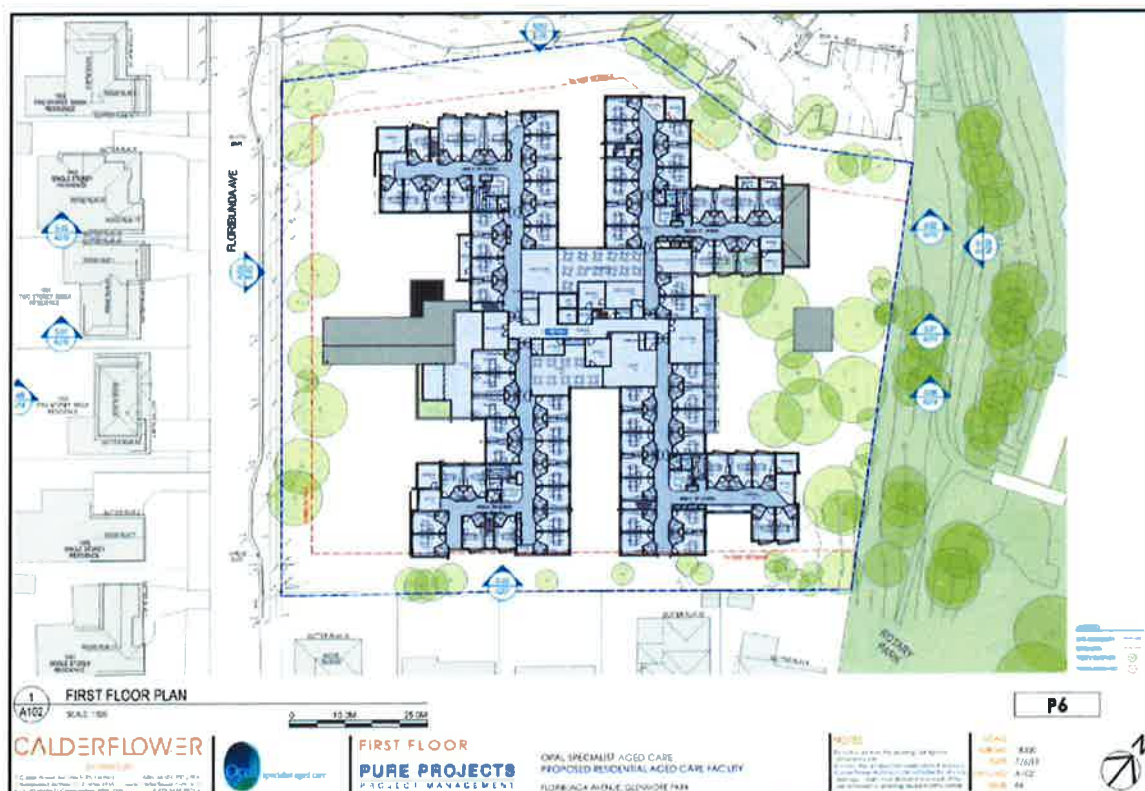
Proposed First Floor Plan (Source: Calderflower Architecture, 2019)
